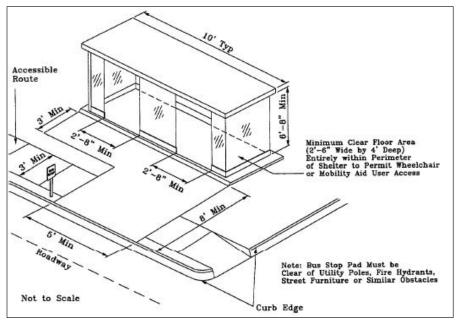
Minimum shelter and landing area dimensions to meet ADA requirements.
